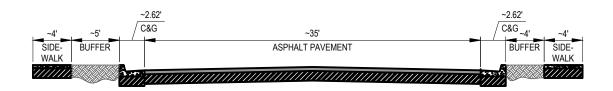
EXISTING 86TH STREET TYPICAL SECTION
